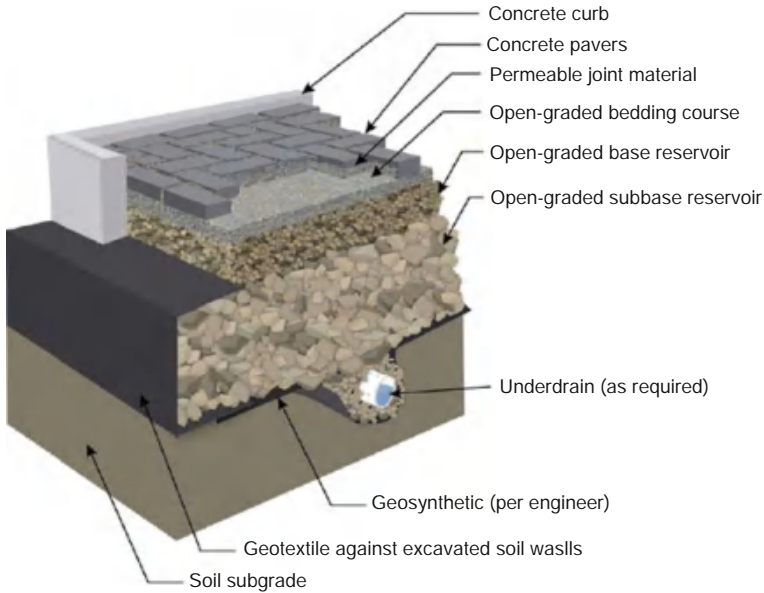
Permeable interlocking concrete pavement design. *Source* FHWA (2015b)
